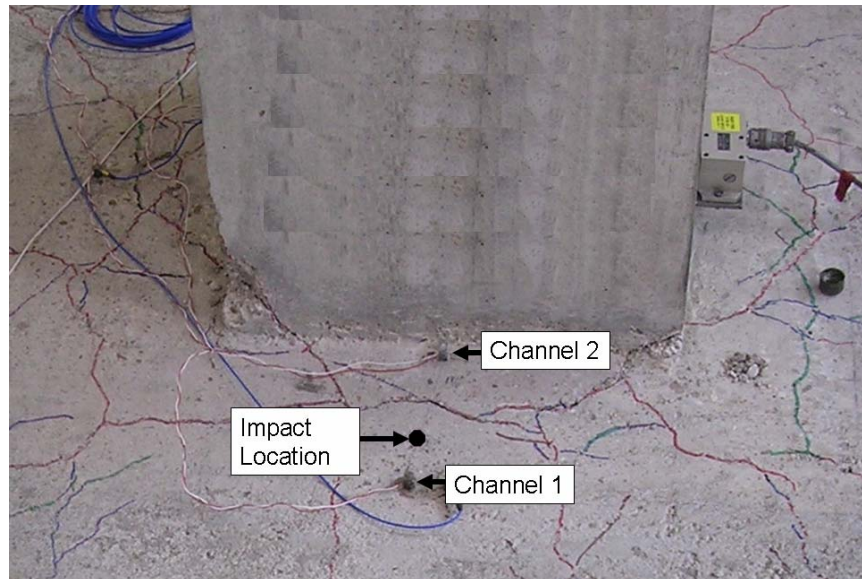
Layout of accelerometers used to measure depth of critical crack in Specimen L0.5 (North Axis)
